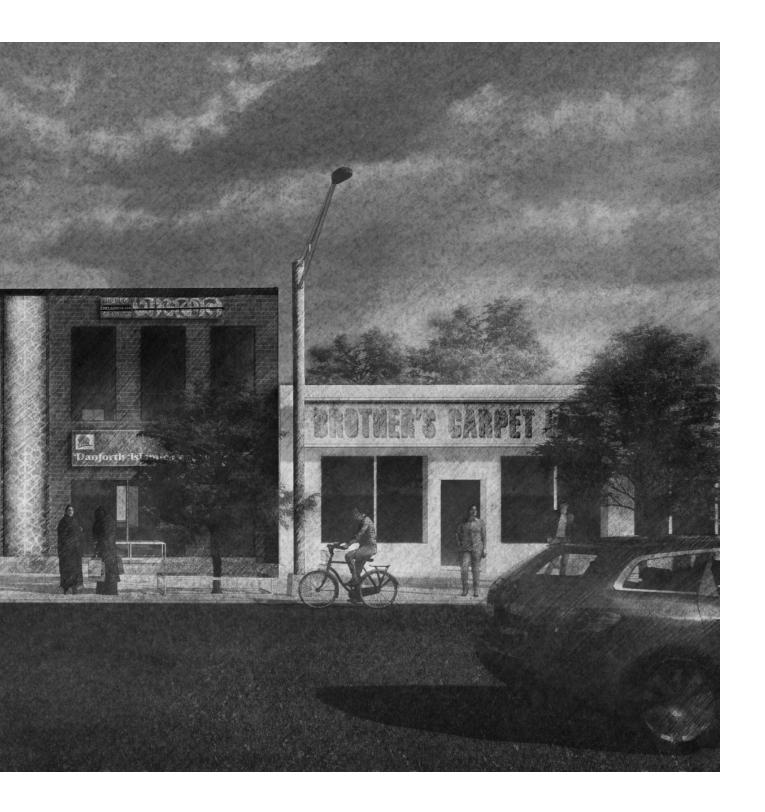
Exterior - Front Elevation/Fruit Sale
